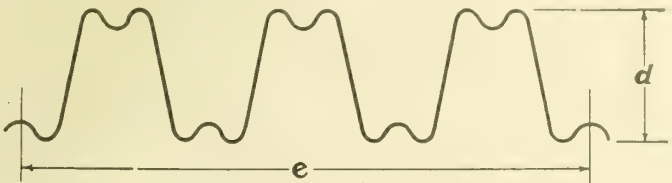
END SECTION OF MULTIPLEX STEEL PLATE
